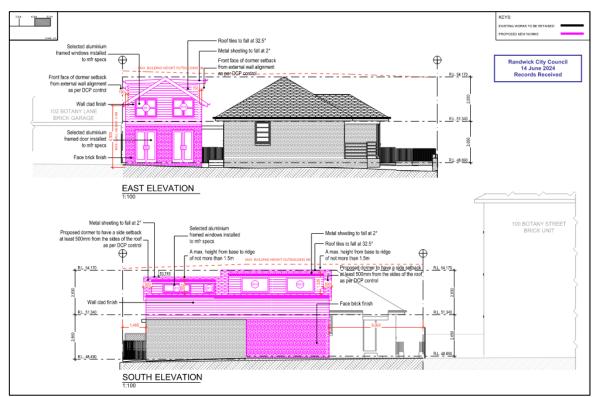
East and South elevations of pre-lodgement submission (Source: Gardner Design and Drafting).
